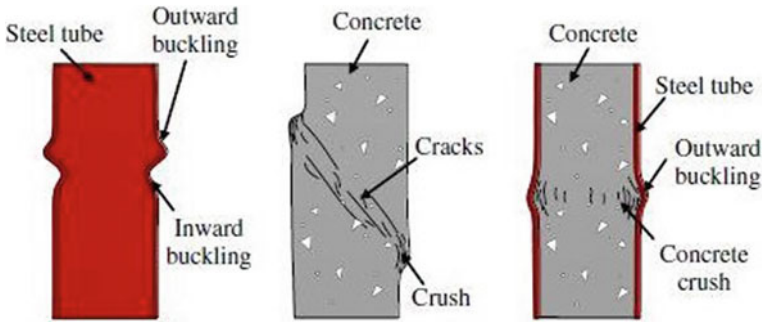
[1] Schematic failure modes of hollow steel tube, concrete and CFST stub columns
